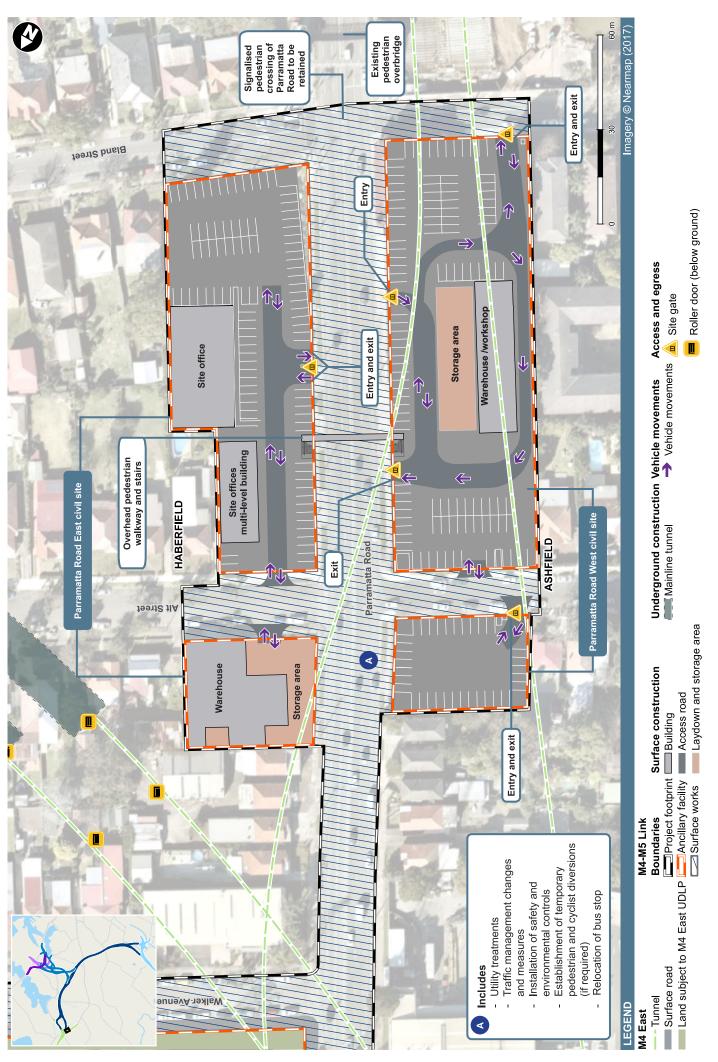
Indicative Parramatta Road West and East civil sites layouts
